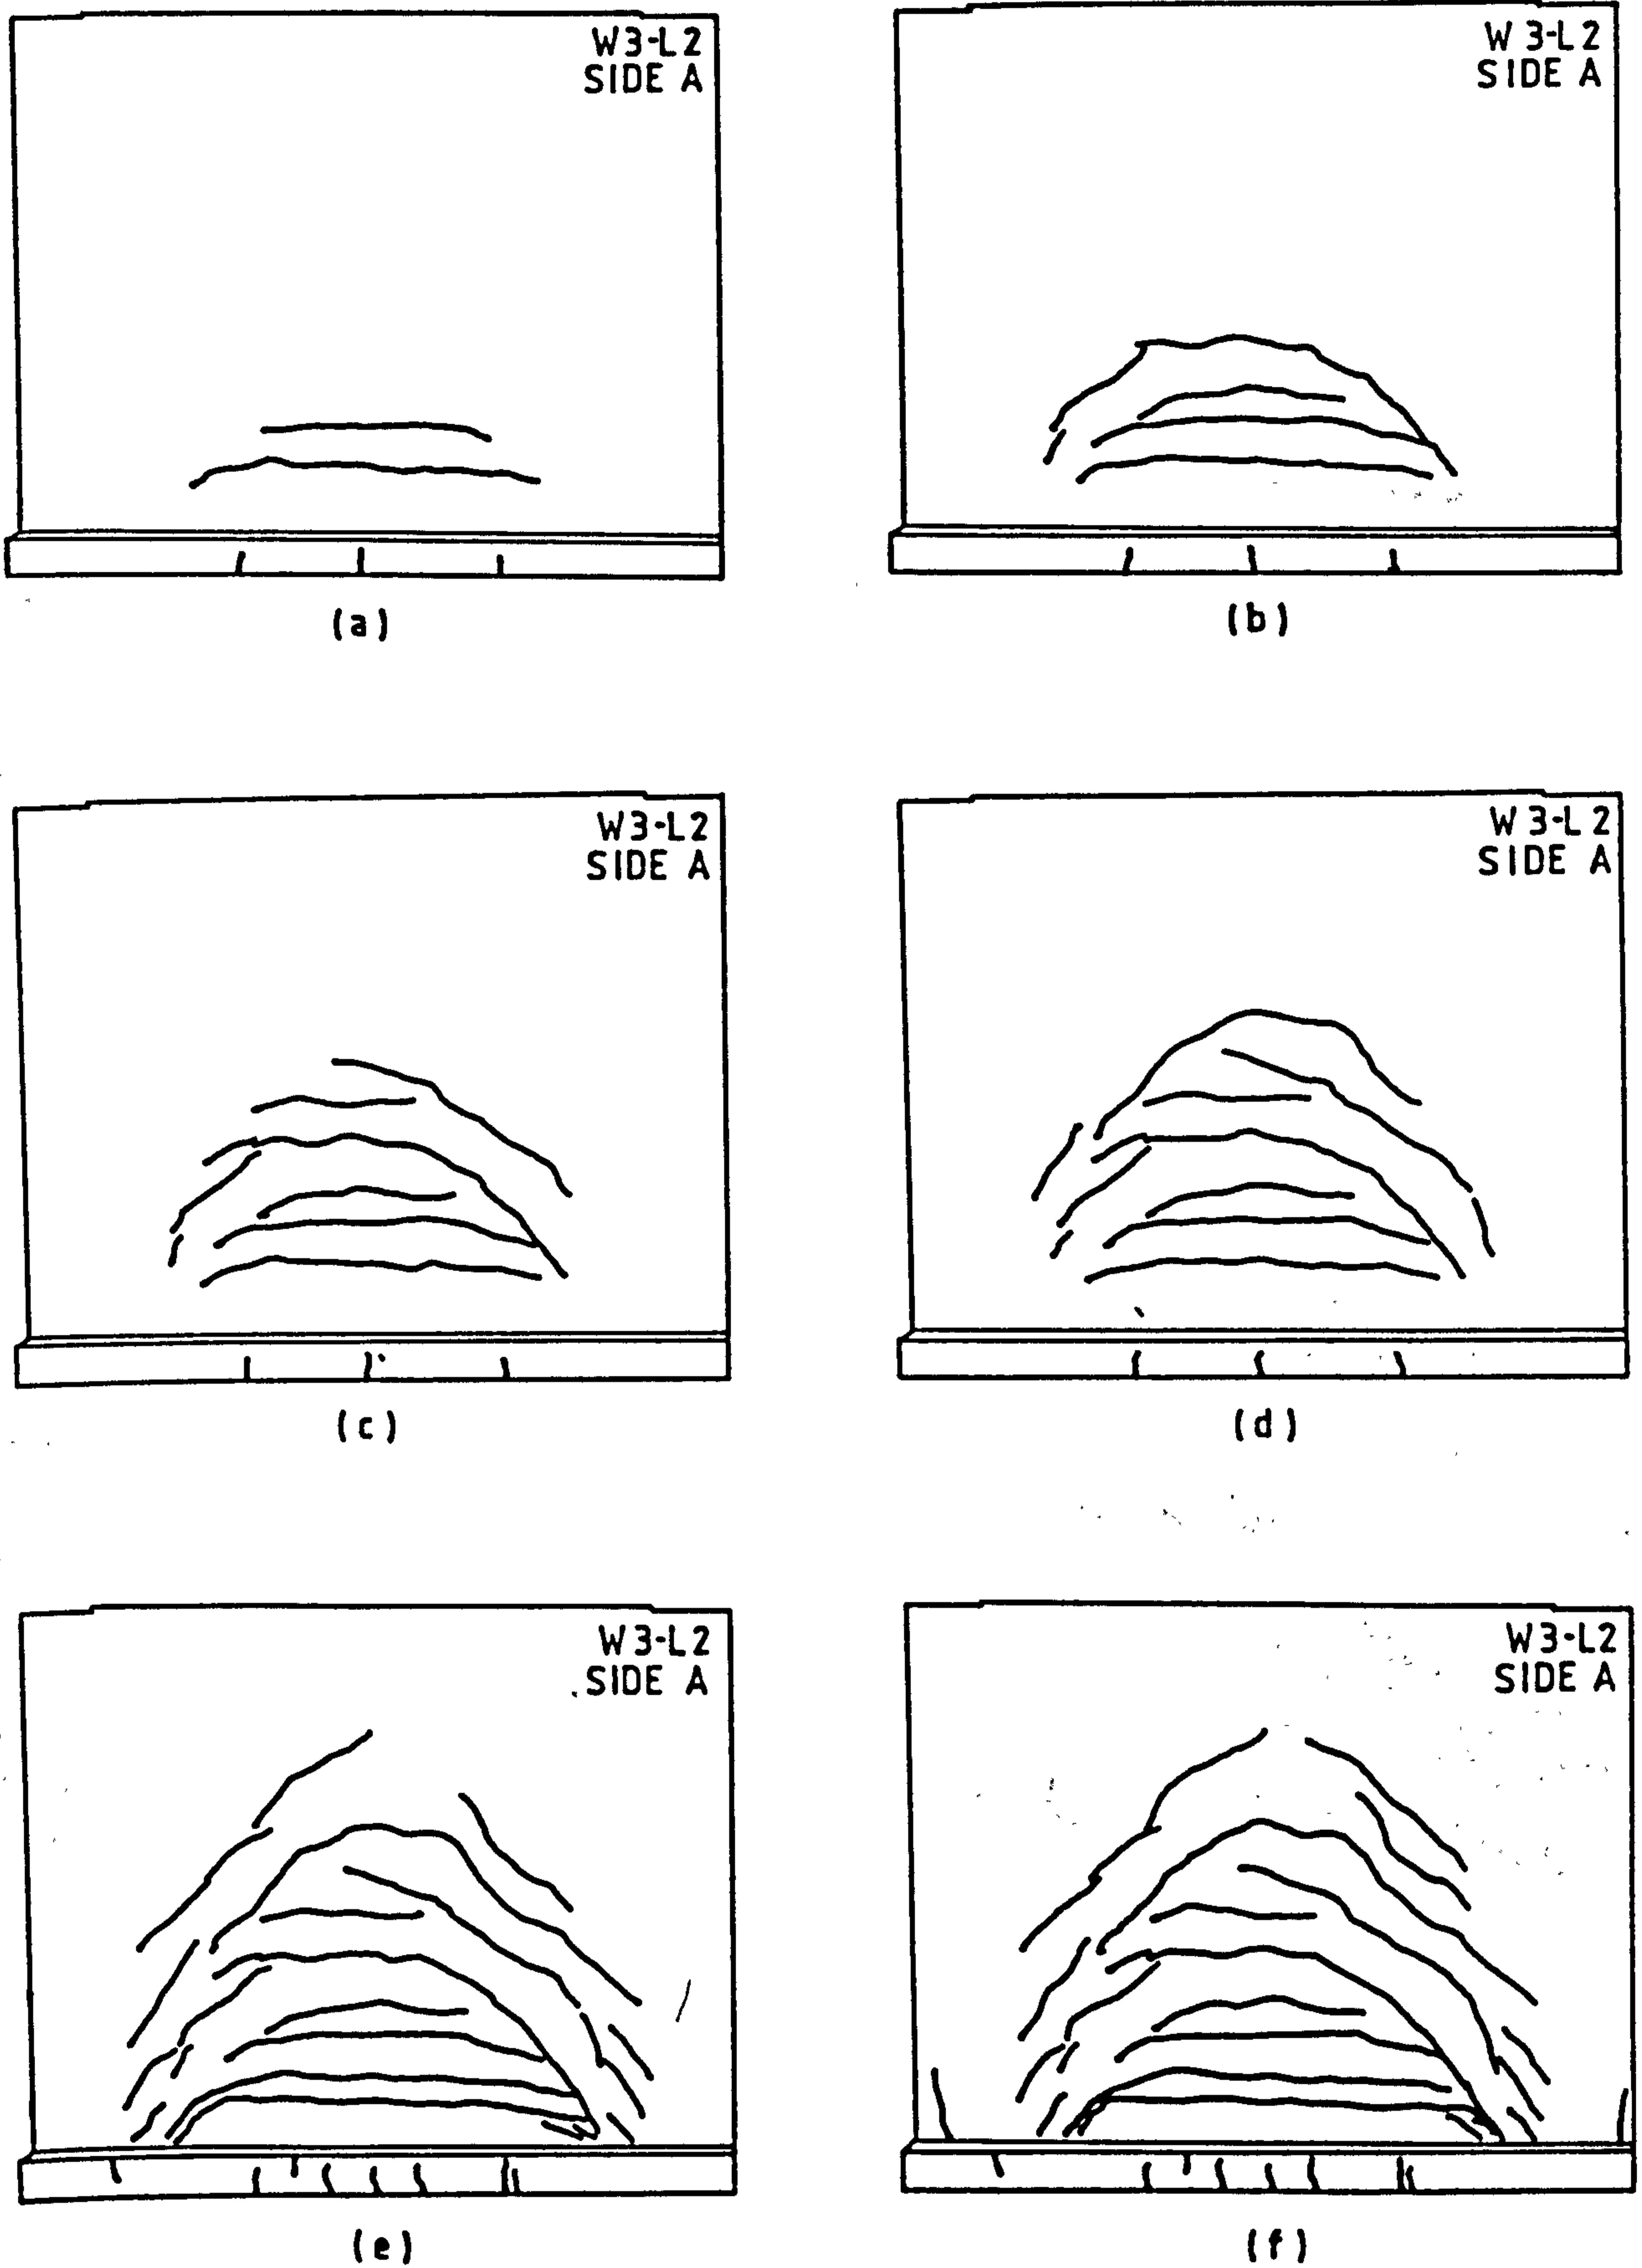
Development of cracks in wall W3-L2
